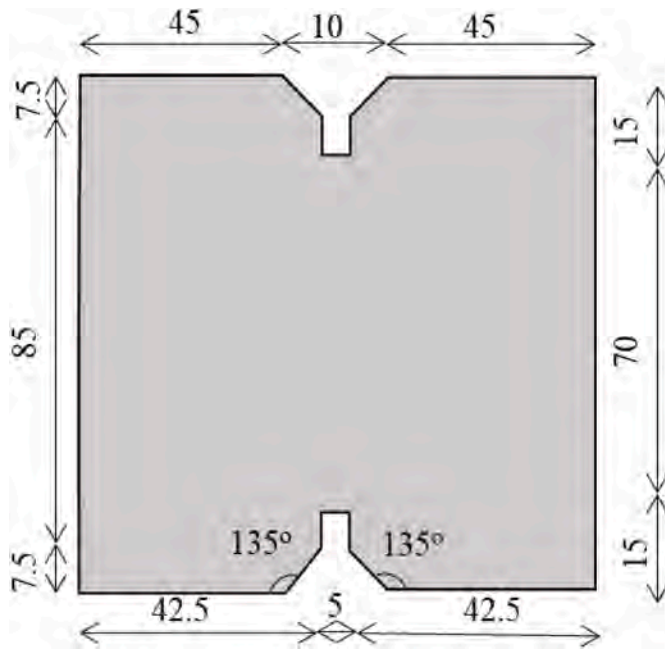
Shape and dimensions of Double Edge Wedge Splitting test specimens. (Unit mm).
